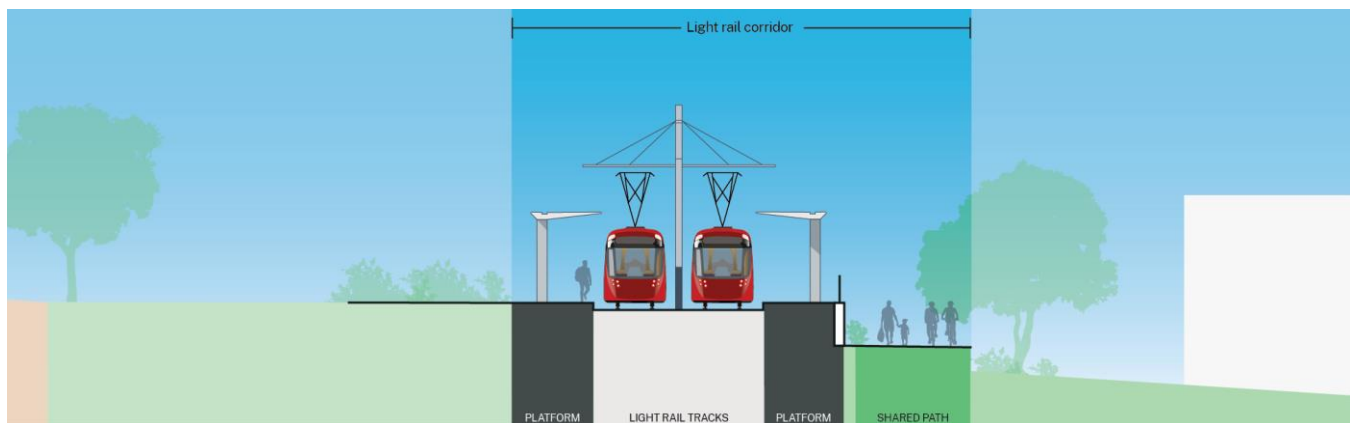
Indicative cross section of off-road (separated) arrangement with stop
